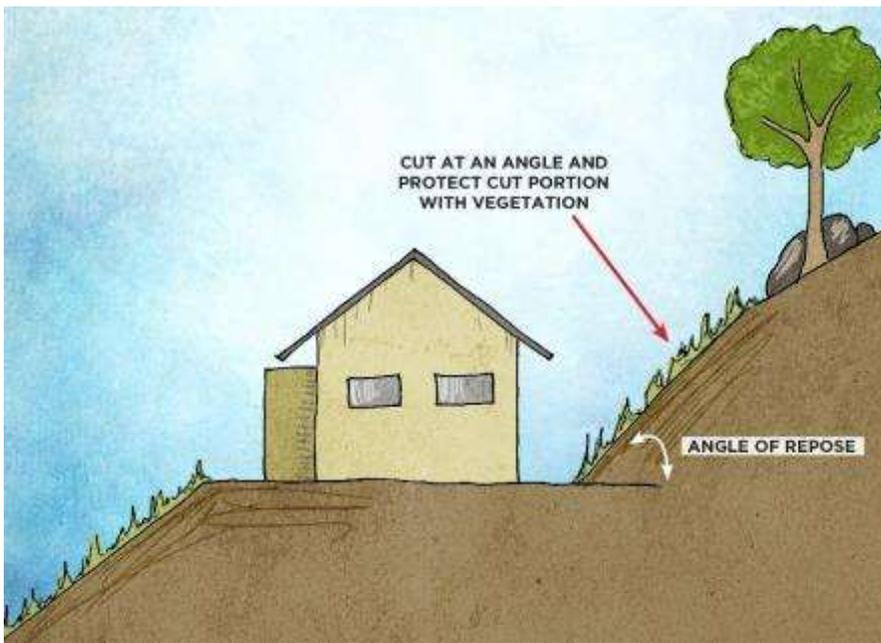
BUILDING ON A STEEP SLOPE
